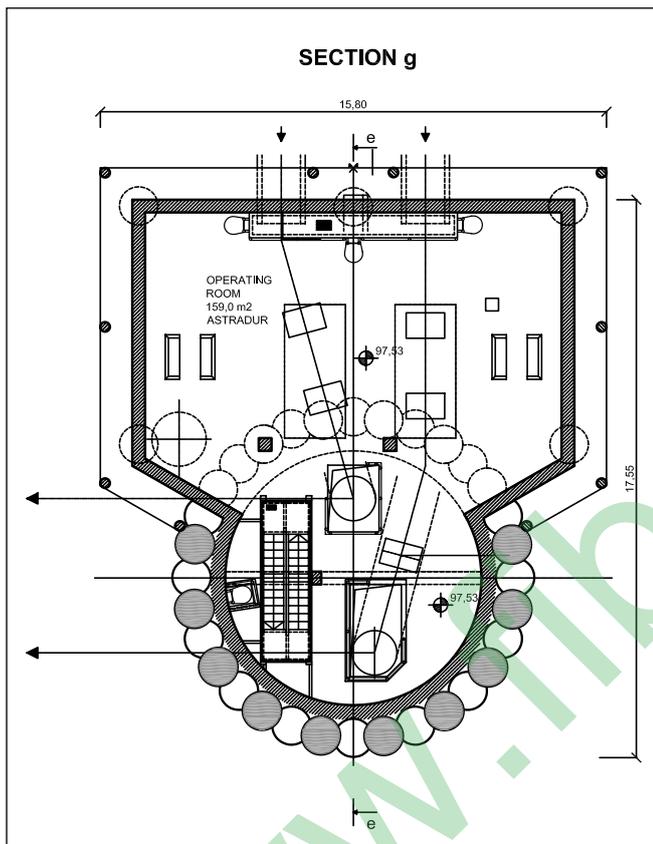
Horizontal section (g) of the structure "A" (final status)
